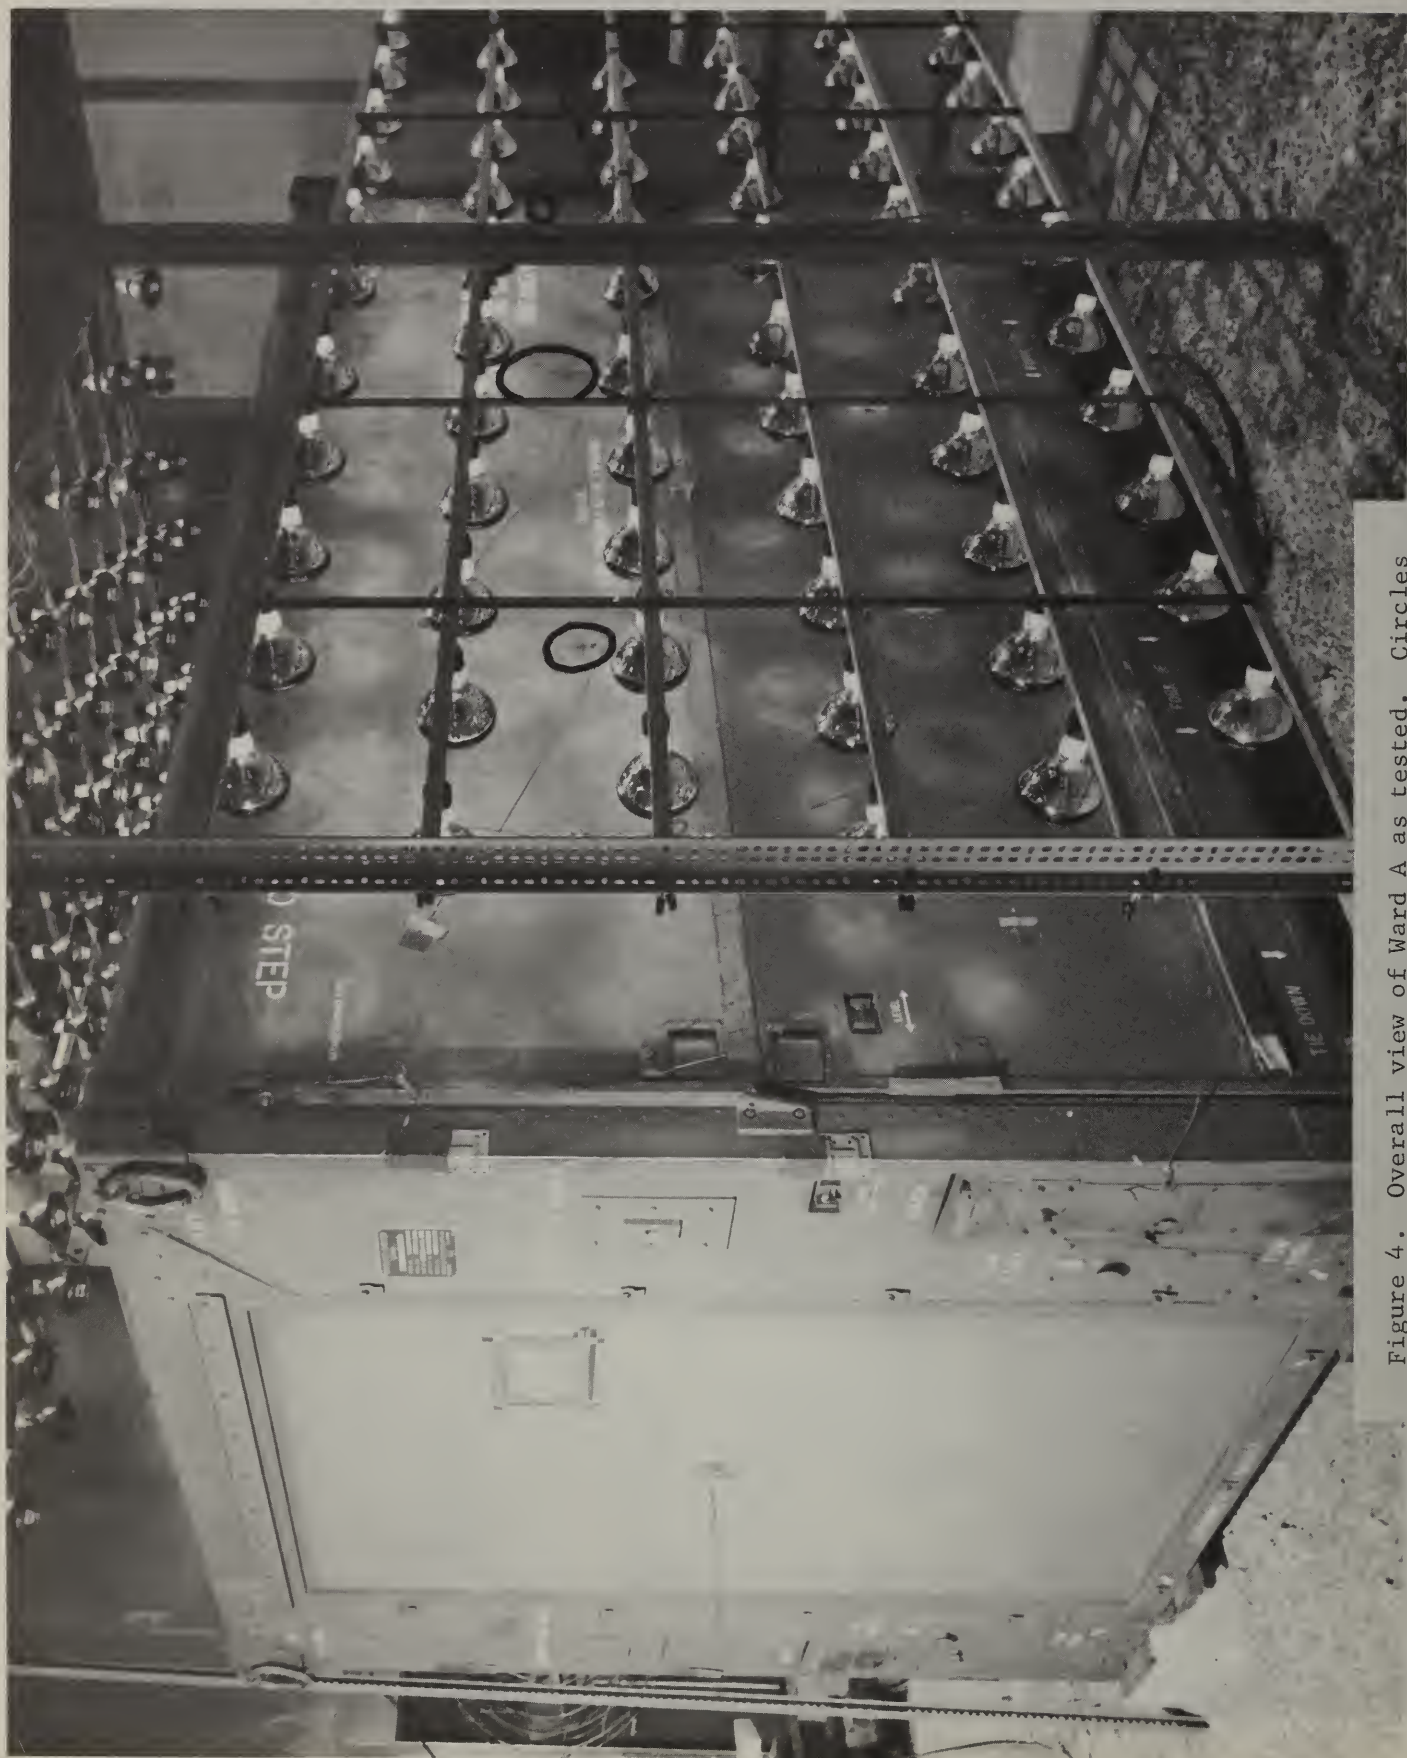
Overall view of Ward A as tested. Circles on folding roof section indicate areas found to be delaminated.
